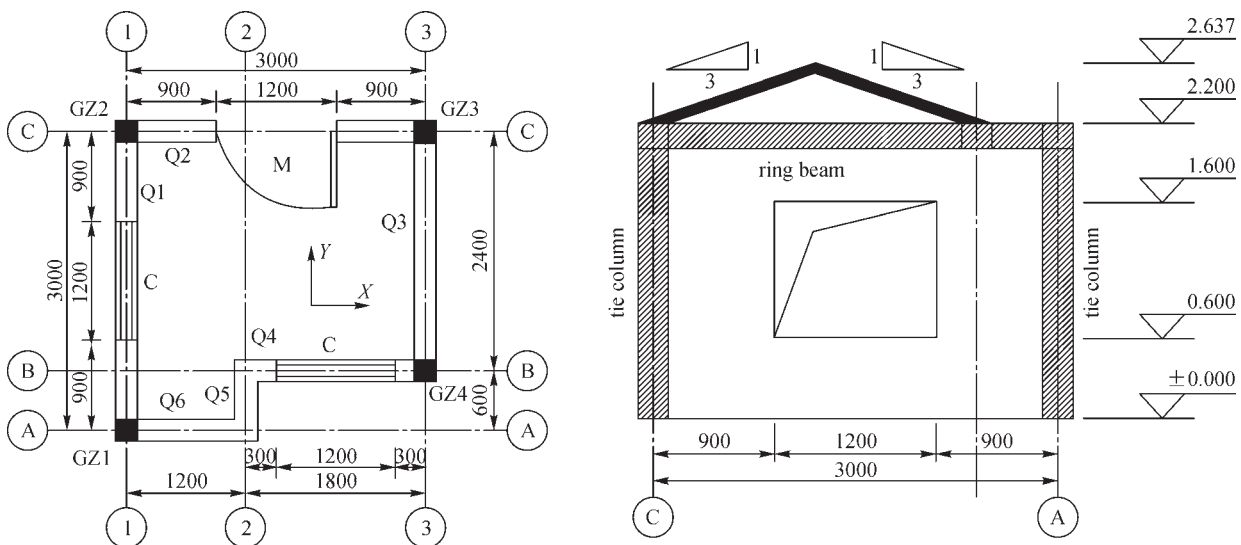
Plane layout and elevation of the RAC block masonry structure (unit: mm). (a) Plane layout; (b) elevation
